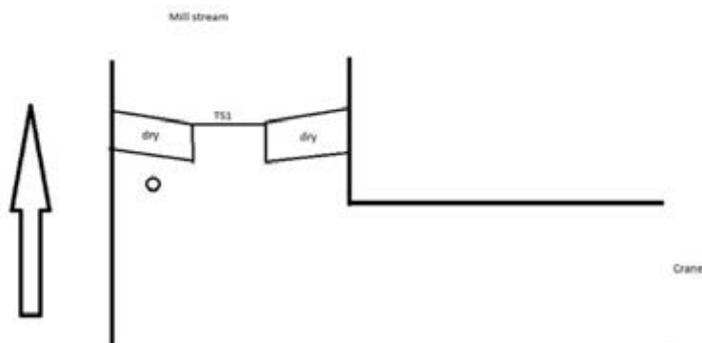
Site plan for Mill Stream Barrier 4
